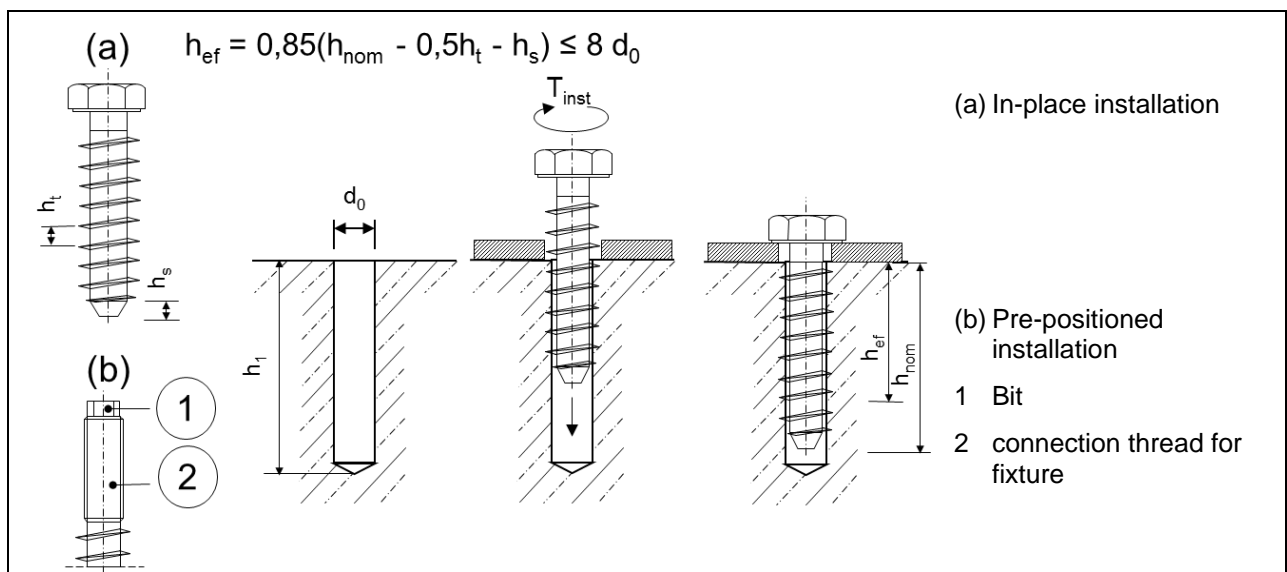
Installation by driving the concrete screw with a self-cutting special thread with wrench or impact screw driver into a predrilled cylindrical hole.
